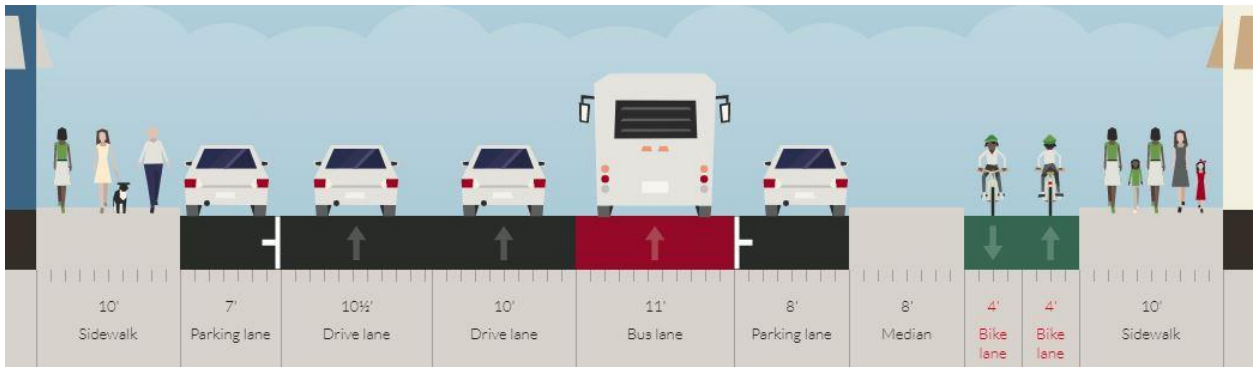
Typical Cross Section of Folsom Street between 6th Street and 5th Street, looking east
